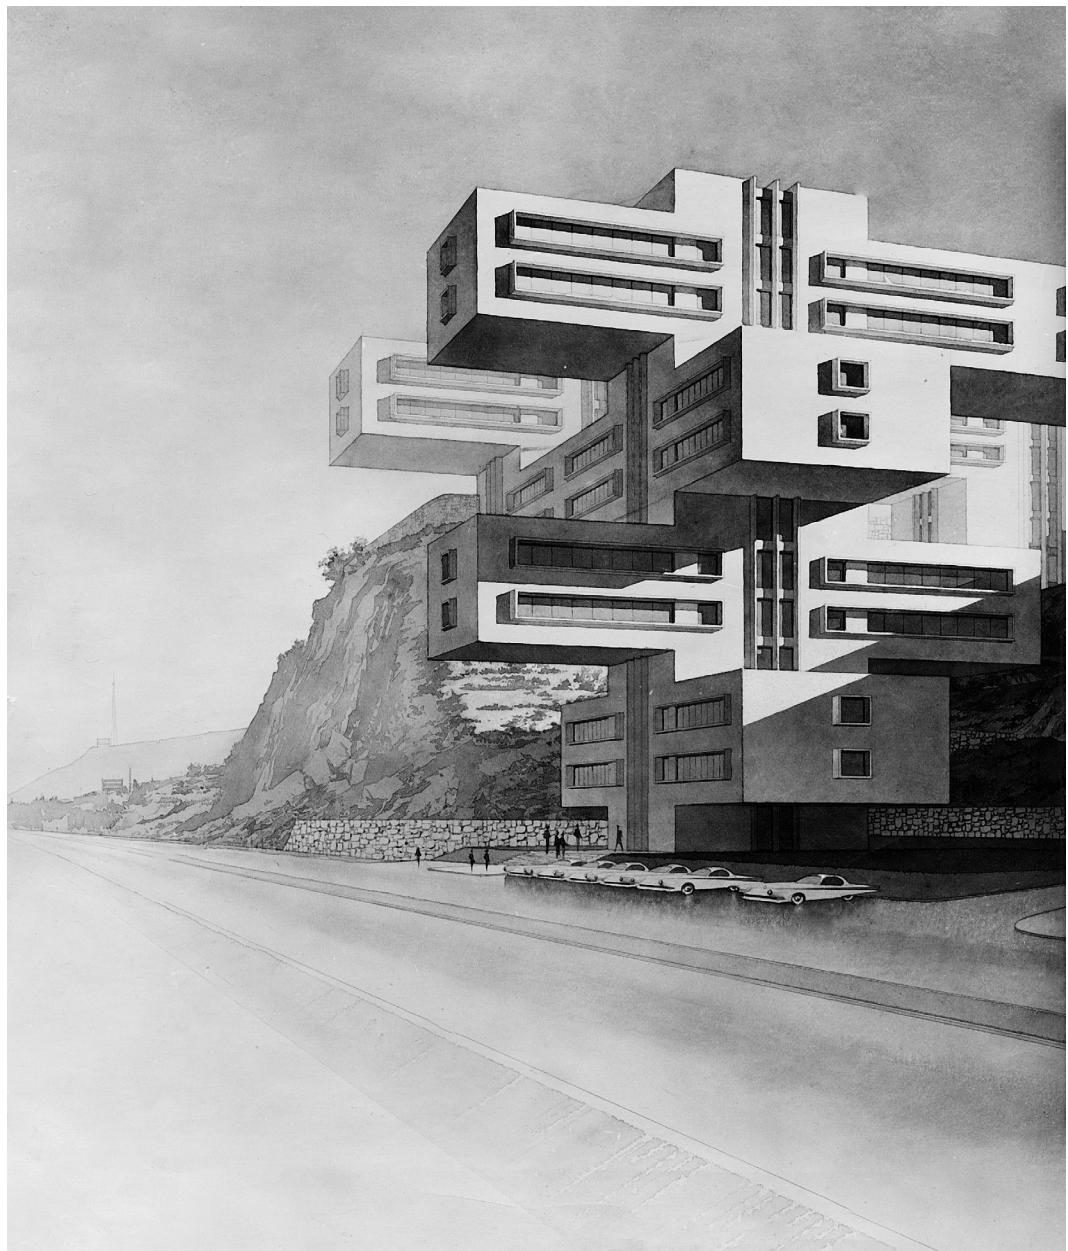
2. *Sketches of the building's facade - architect Giorgi (Gogi) Chakhava's personal archive
